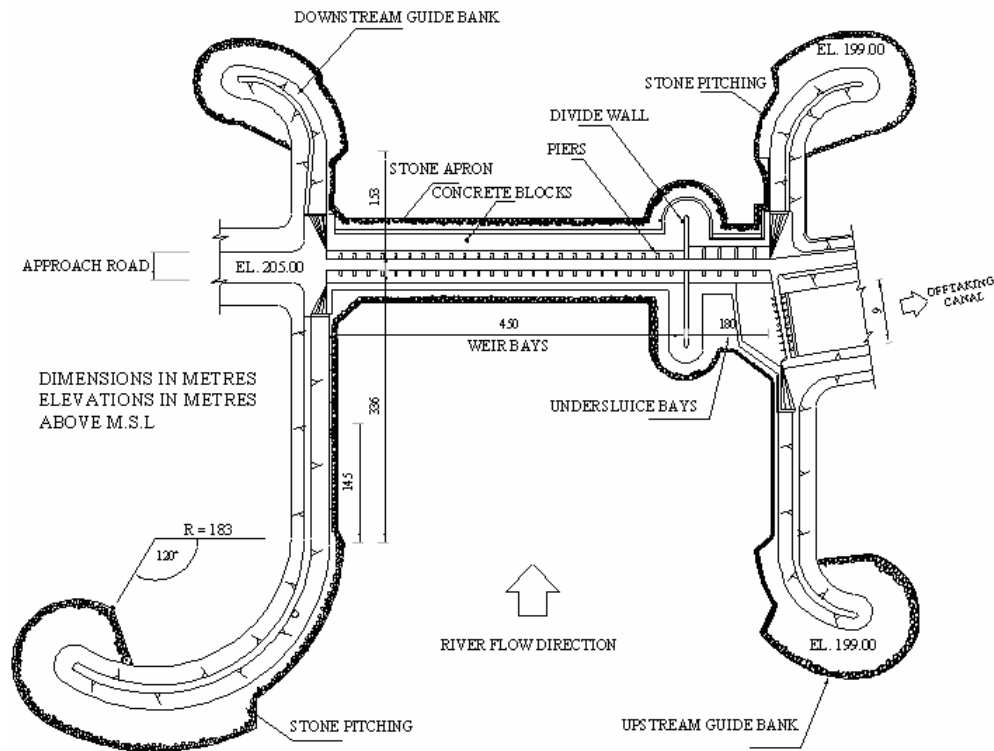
(a) Layout plan of Okhla Barrage on River Yamuna, India
